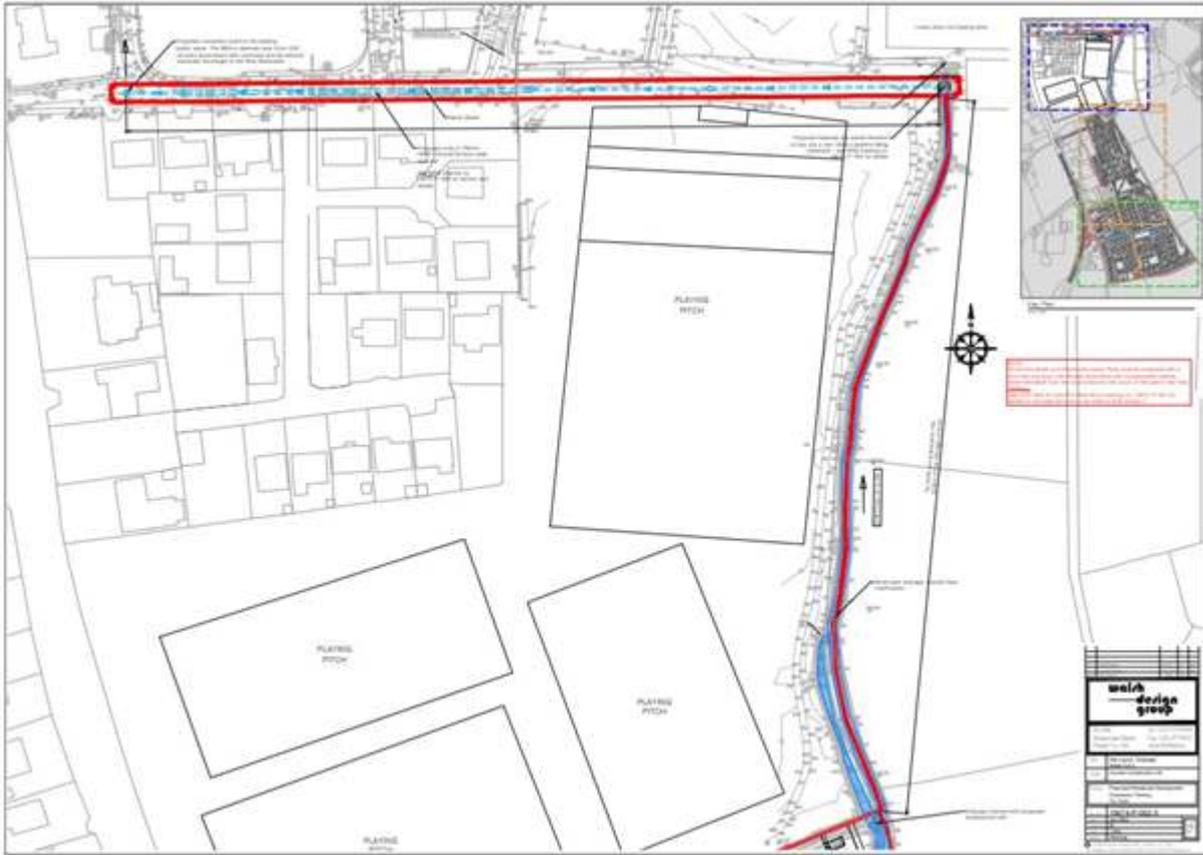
WDG Drawing No. 19074-P-002-3 - Northern Extension of the Site Drainage Layout (Not to Scale)
